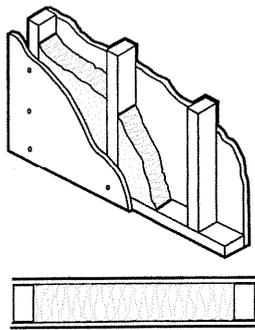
Conventional wood stud construction, single layer gypsum wallboard each side,  $3\frac{1}{2}$ " thick fiber glass insulation in wall cavity. STC: 39.
